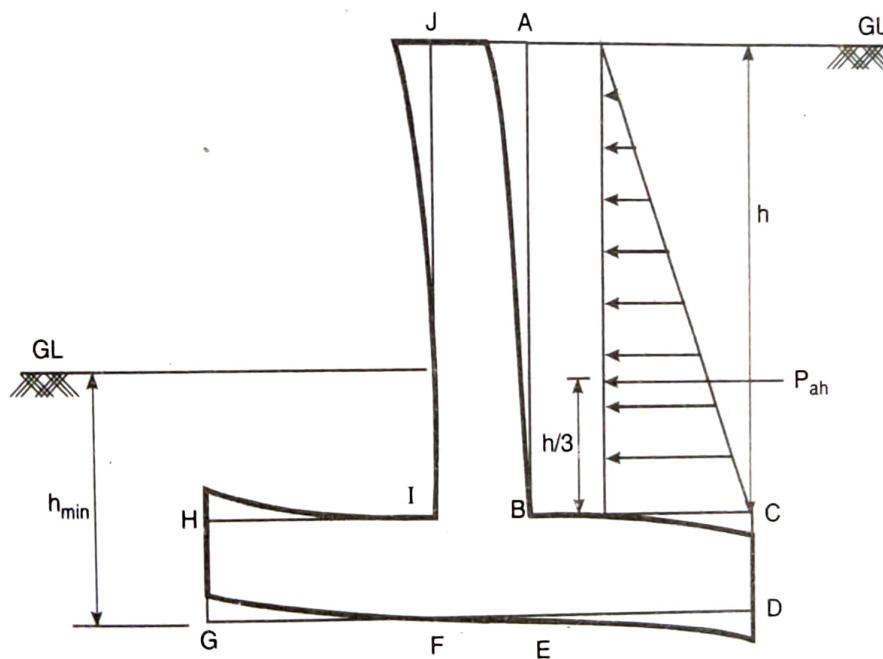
Diagram showing the deflected shape of various components of retaining wall under loading
